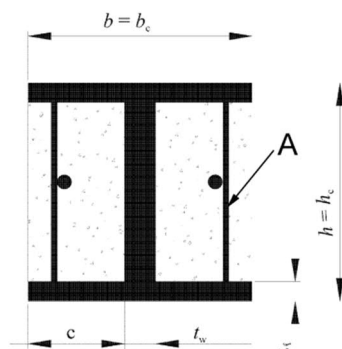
Detail of transverse reinforcement, with the additional straight bars (links) welded to the flanges.
